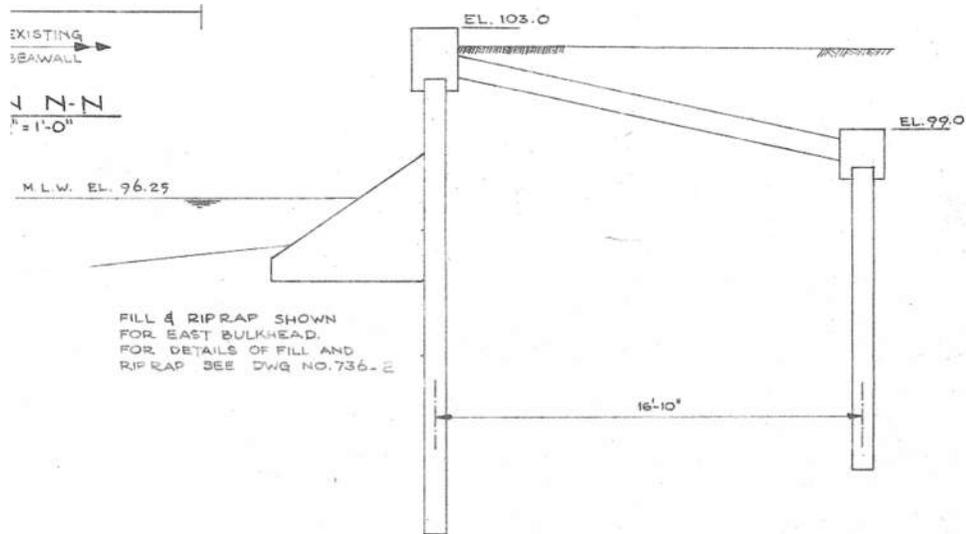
Typical bulkhead section from 1958 plans for Pier section of wall
